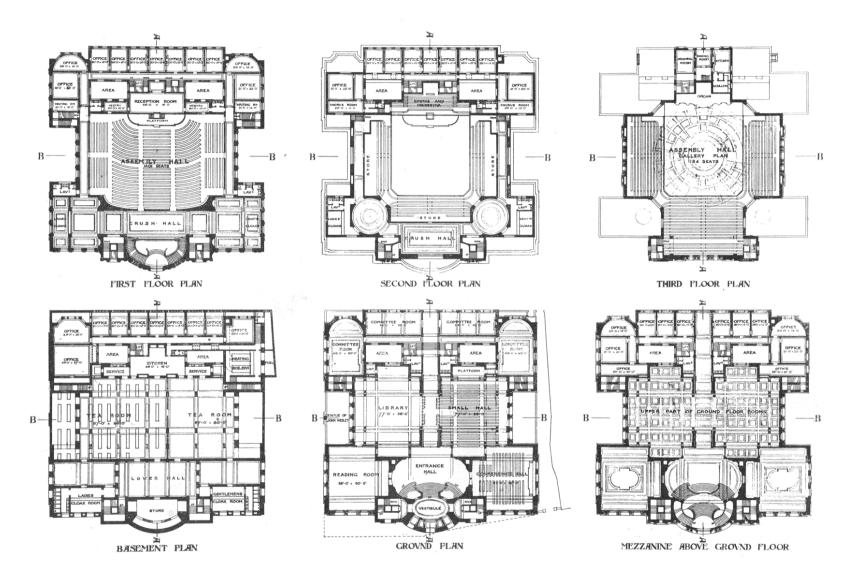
Plans of Westminster Central Hall. Source: The Architectural Review
